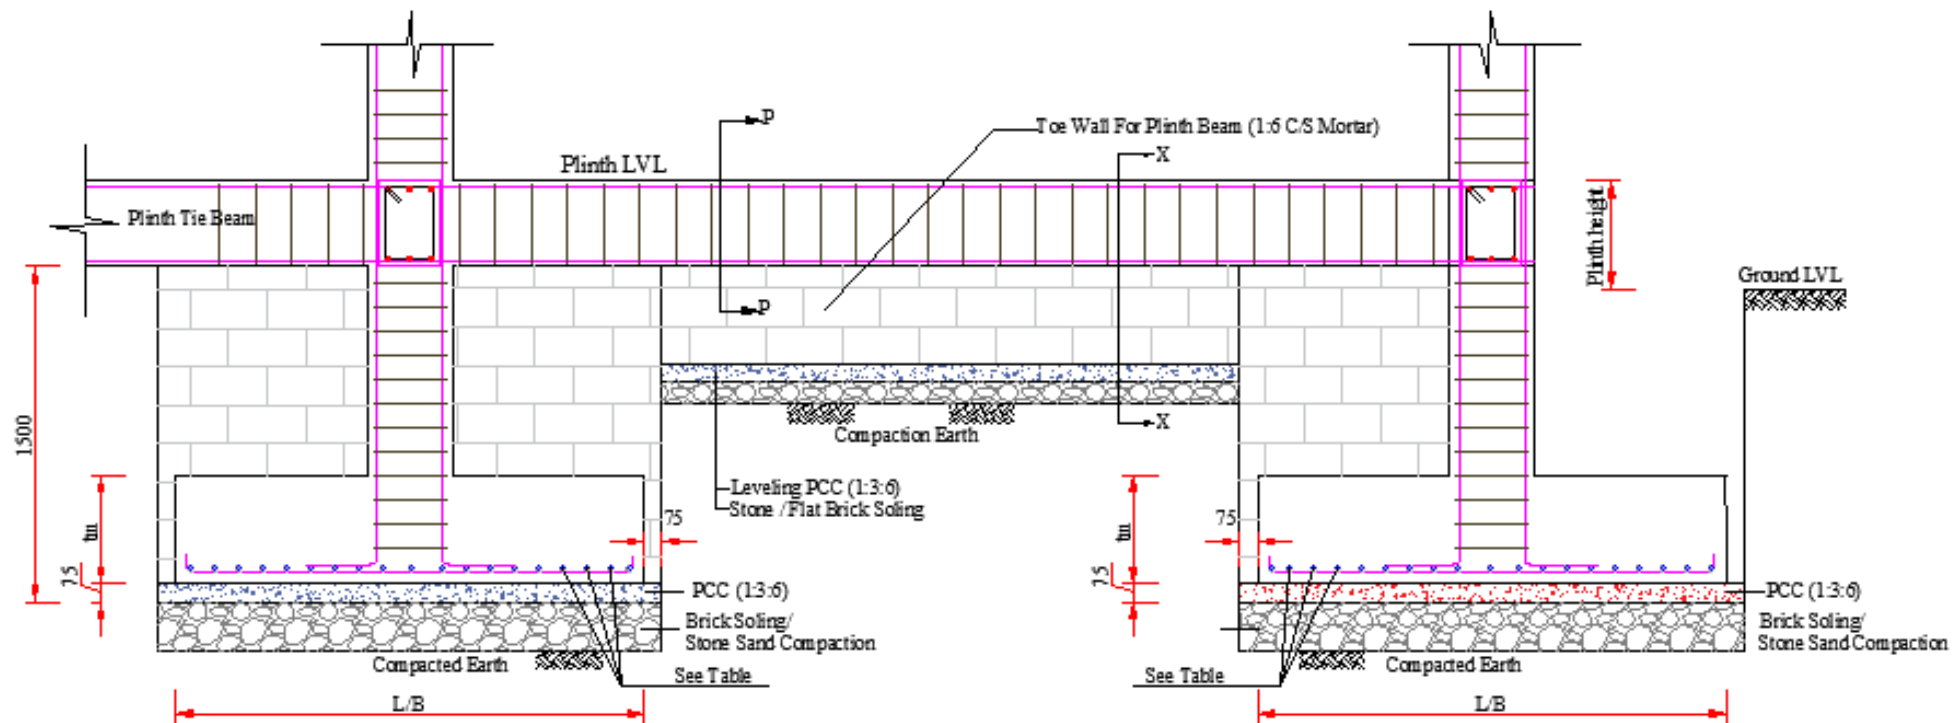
TYPICAL ISOLATED FOOTING DETAIL OF TWO STOREY BUILDING
